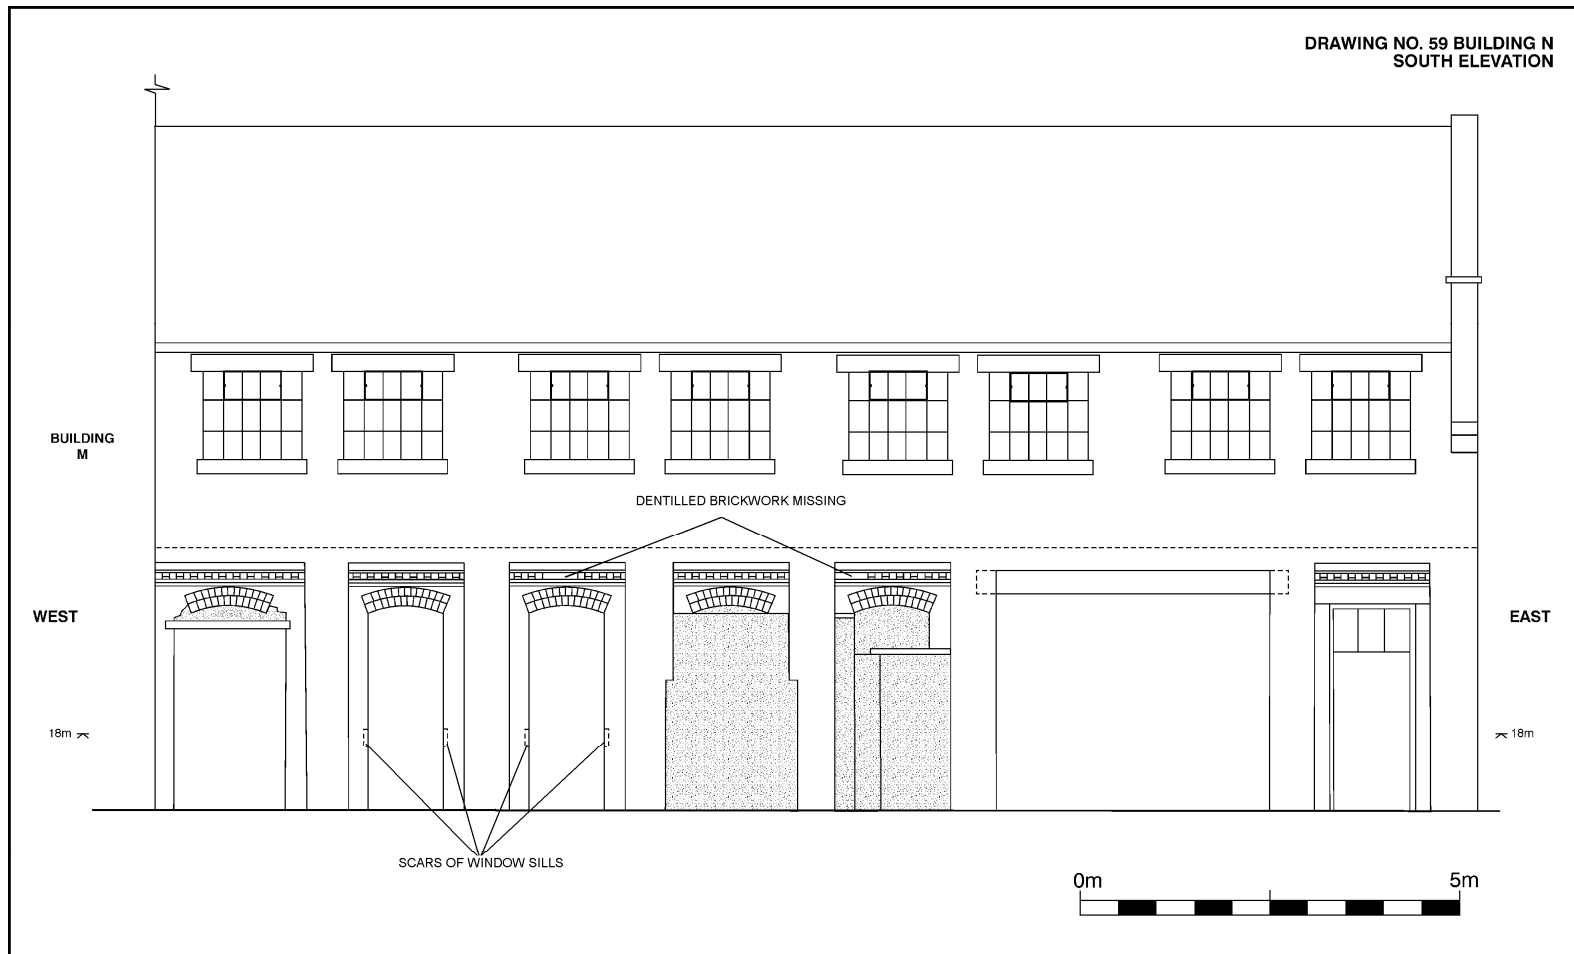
Survey drawing of the south elevation of Building N (scale 1:100)
